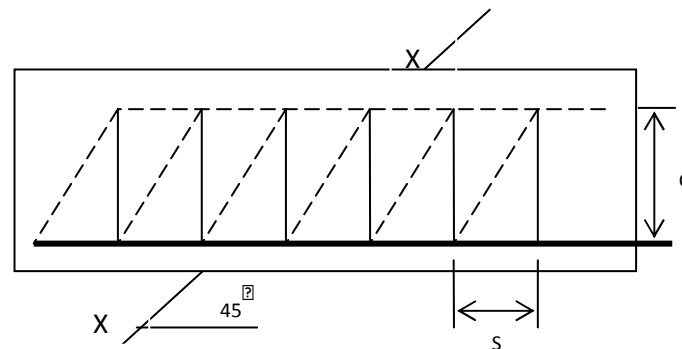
Members of a pin jointed truss with concrete (---) compression and steel (___) tension. $\alpha = 45^\circ$
